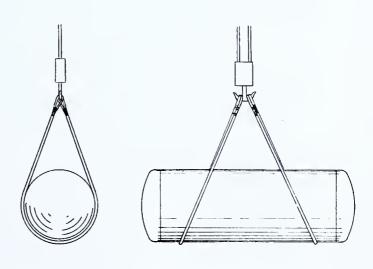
Lifting a Cylindrical Tank in a Sling
